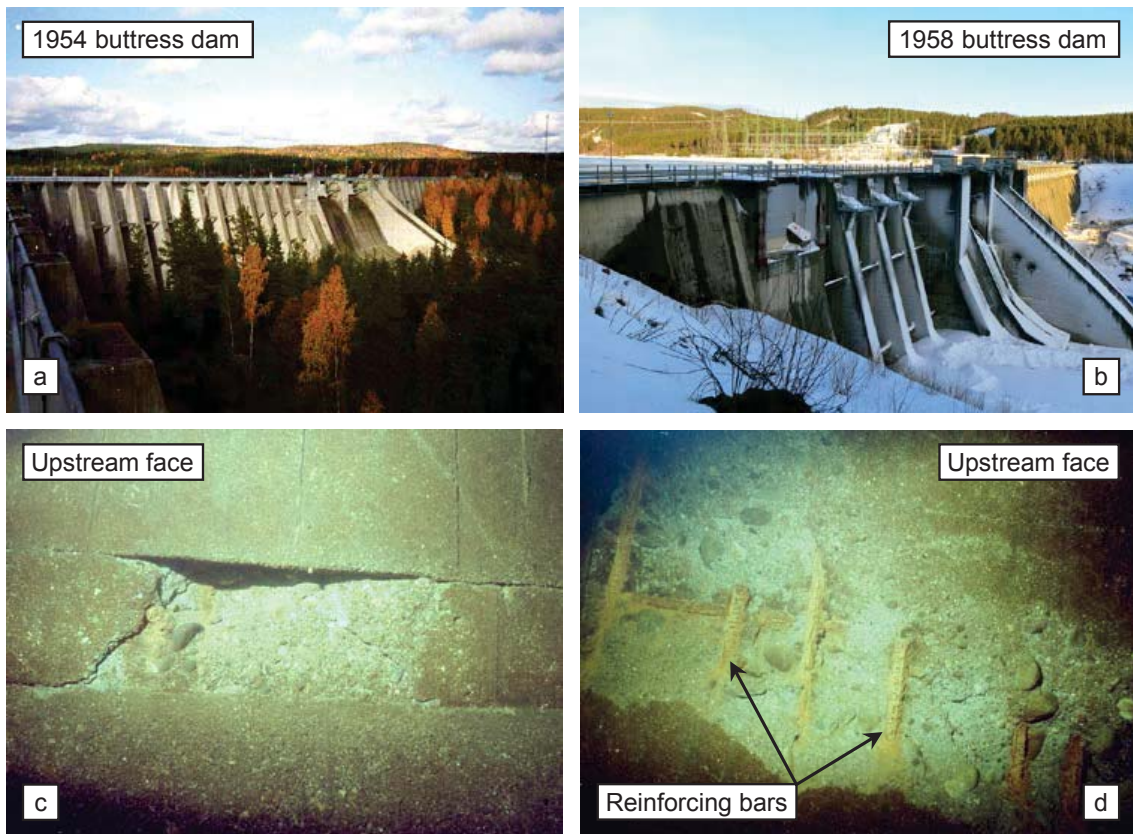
Two of the largest concrete dams in Sweden (a–b). After less than 40 years in service, areas of concrete spalling on the upstream face were discovered (c–d). Photos provided by Uniper.
